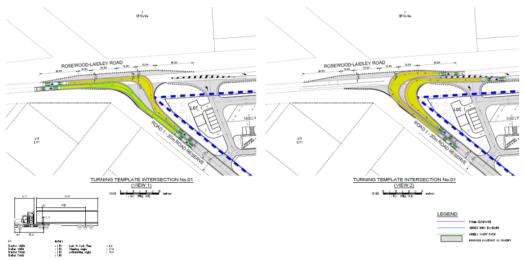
New Road / Rosewood Laidley Road Intersection AV Swept Paths
